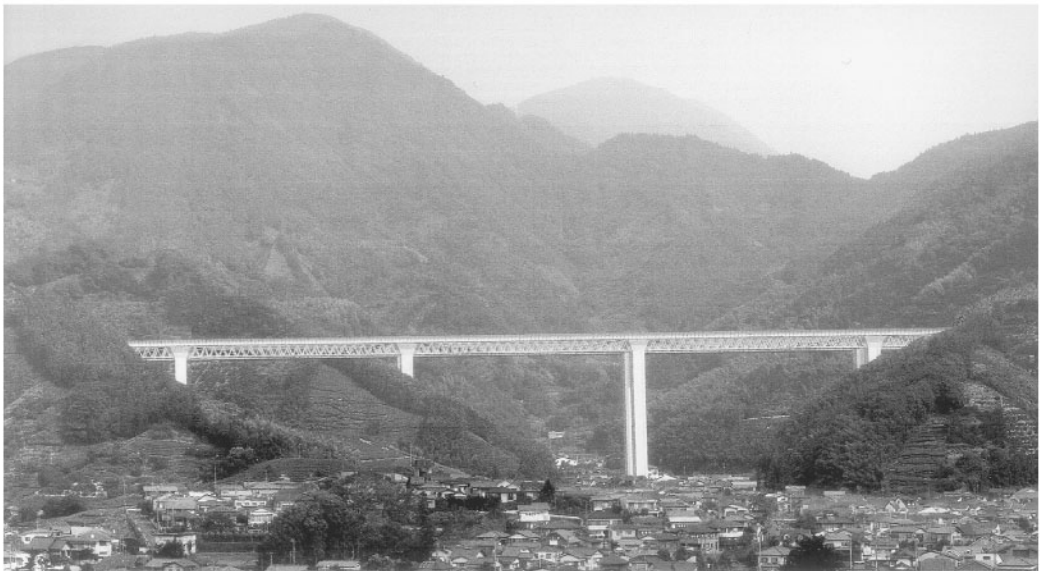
Tomoegawa Bridge. (Courtesy of Japan Highway Public Corporation.)
